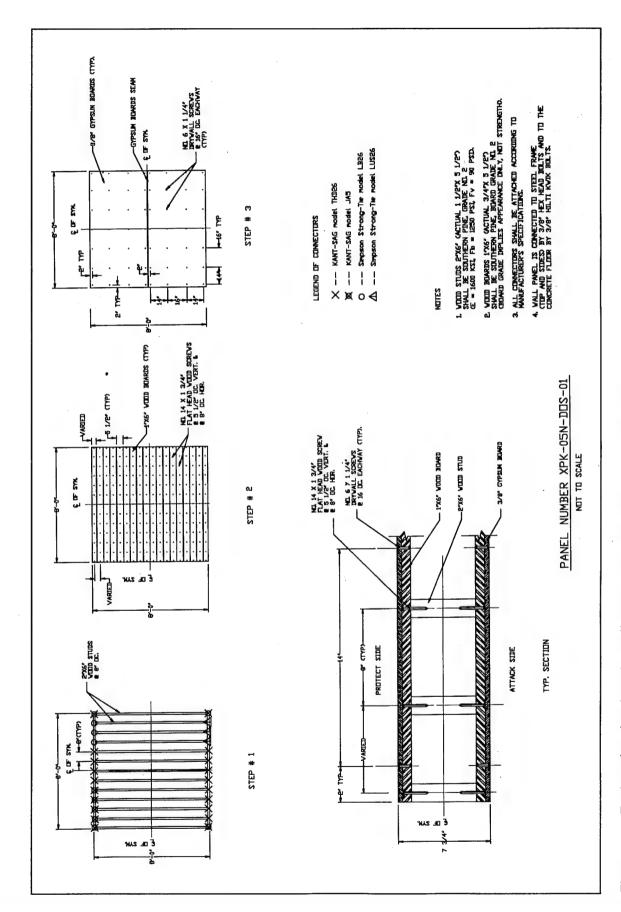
Engineering drawings for wall panel XPK-05N-DOS-01 (non-SI units)
